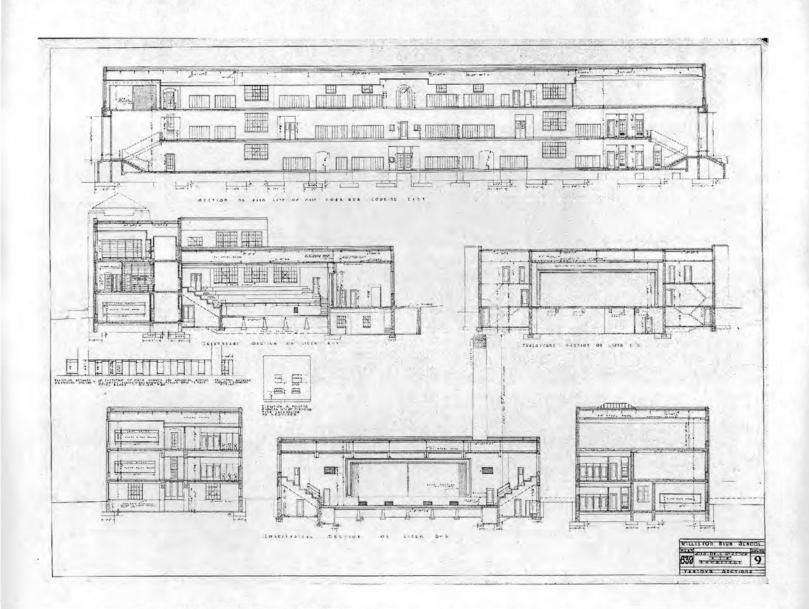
excerpt from DeRemer 1931 architectural drawings; Building sections; sheet 9 of 16
